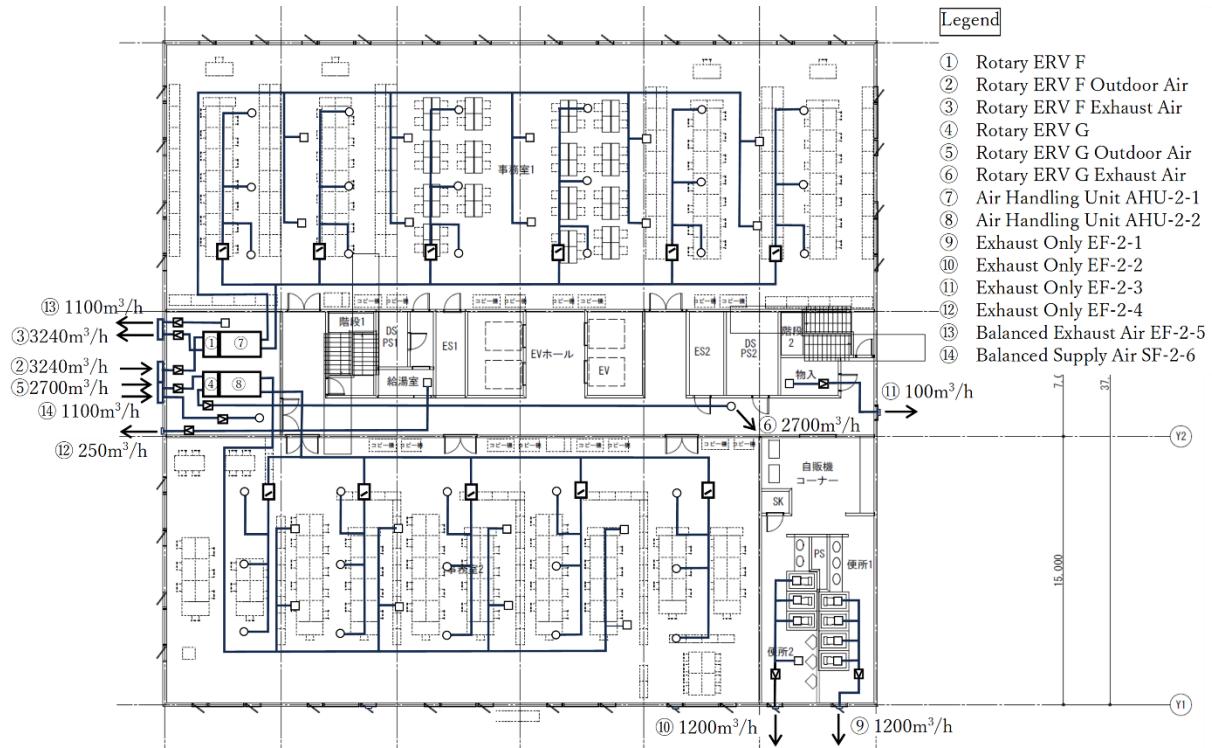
Pattern 3 of Case 1, layout of air handling units, energy recovery units, ducts, air terminal and other ventilation fans (Note: this is a plan for the 2nd to 7th floor of the building described in Table 2)
